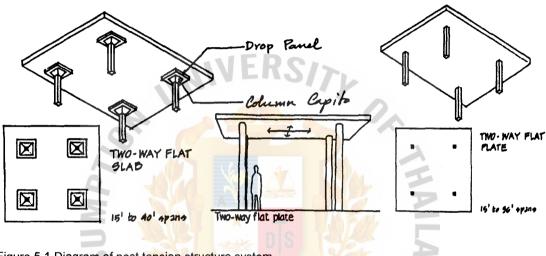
Diagram of post tension structure system (Image Source: http://p-span.wix.com/home#!structural-applications)
